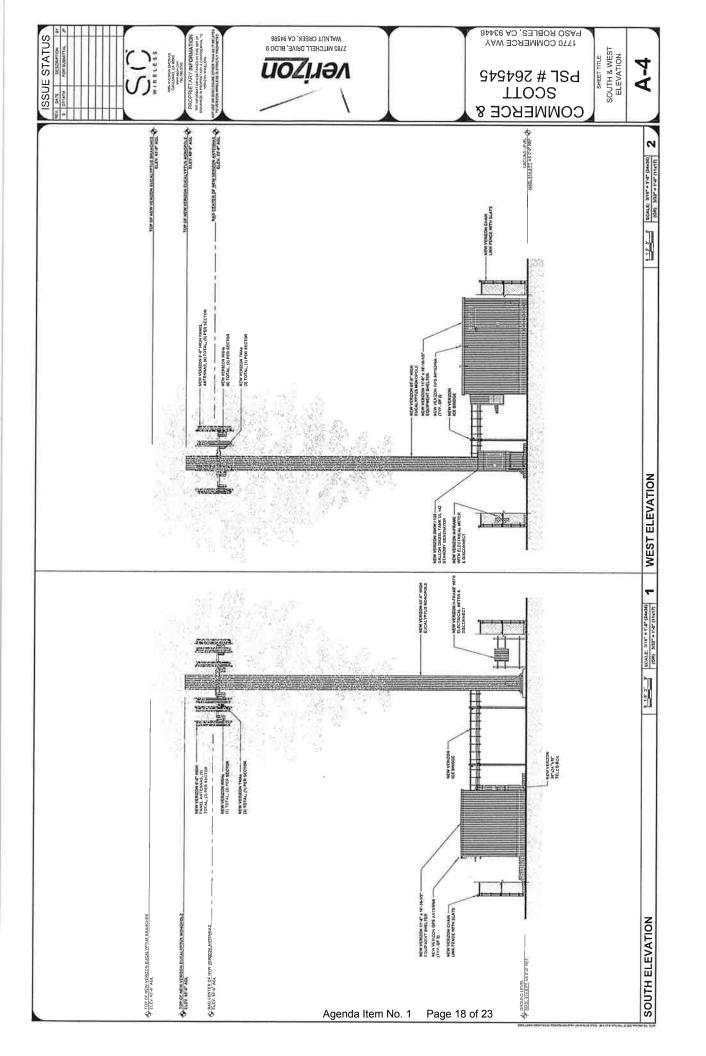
# Exhibit B Equipment/Antenna Layout CUP 14-008 (Verizon - Commerce Way)
